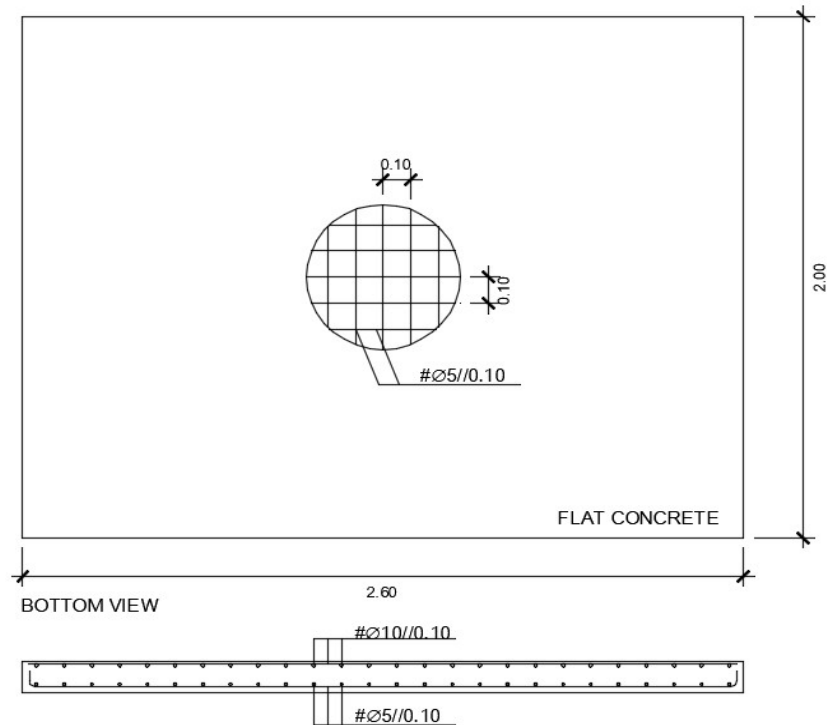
Bottom view of the concrete slab with reinforcement
